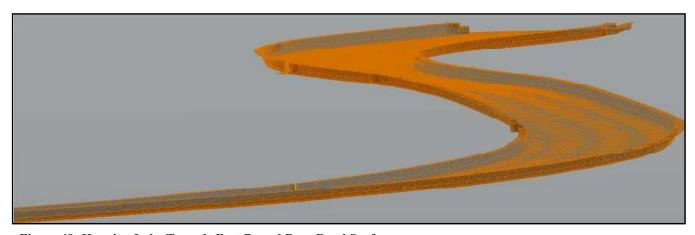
Hanging Lake Tunnels East Bound Bore Road Surface
